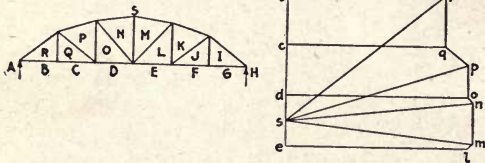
Through Bowstring Truss and Girder Stringer.
